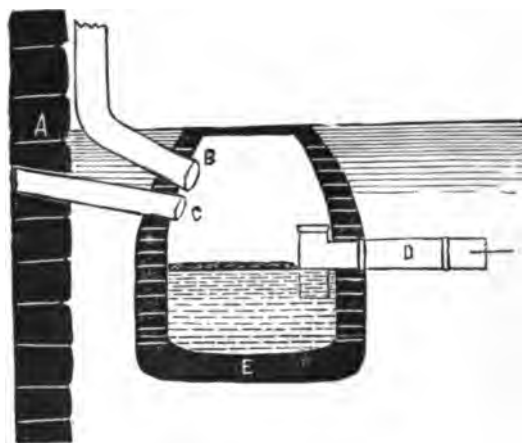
A, House-wall. B, Ventilation Pipe. C, Inlet. D, Outlet.
